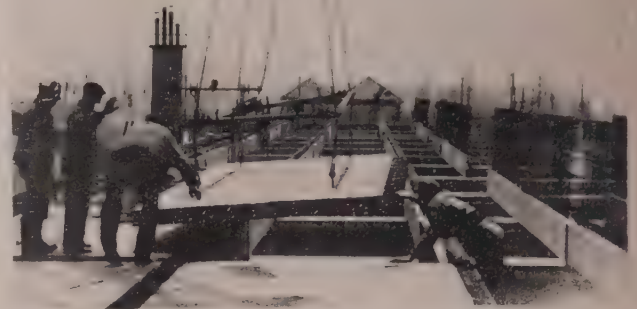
Boulogne Marine Station landing stage under construction. Laying deck slabs into position
